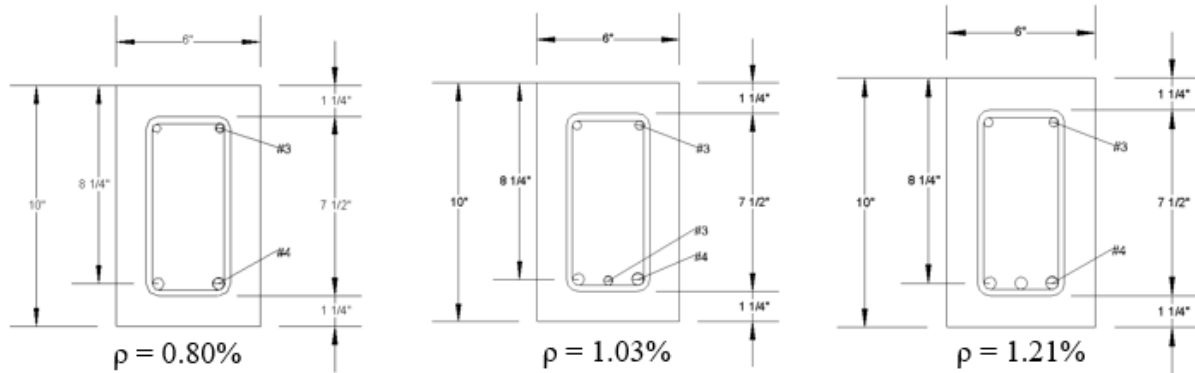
Images. Cross sections of laboratory-scale beam specimens.
